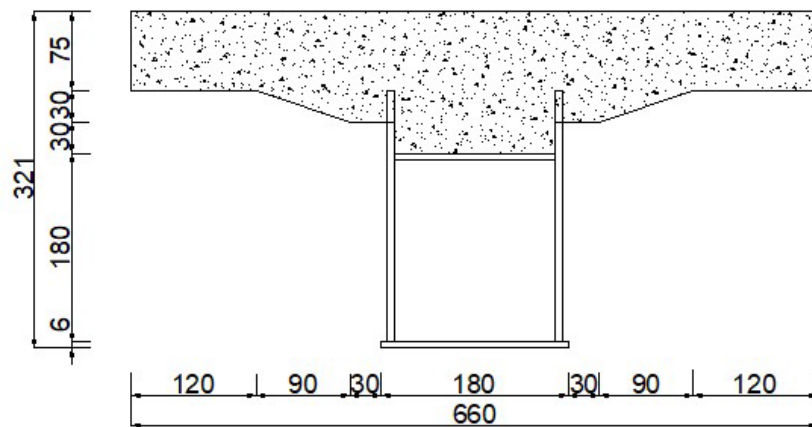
Geometric parameters of MVFT girder(unit:mm).
